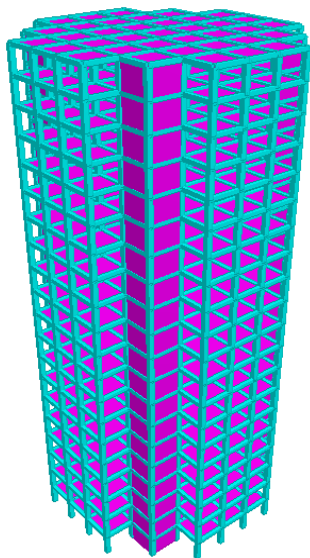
Case WO1: - (Bay size = 5 m x 4 m & shear wall opening area = 0%)
